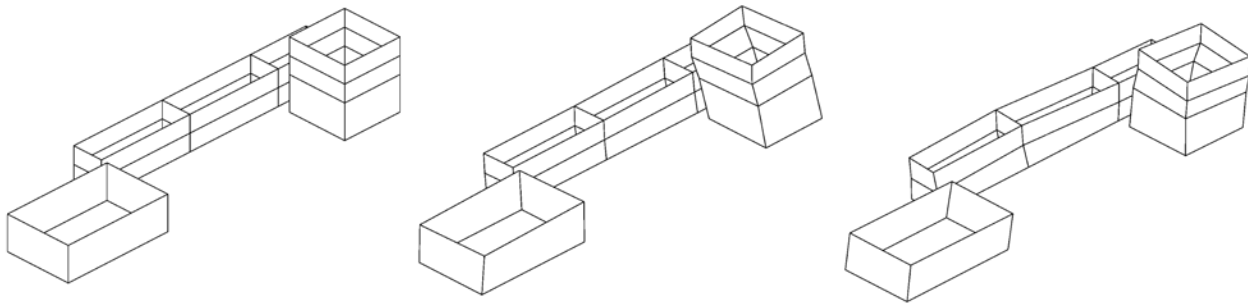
Undeformed and deformed shapes of the monitored buildings during the 2014 event: (a) undeformed; (b) opening of the structural joint between building T and A; (c) opening of the joint between building A end B .
